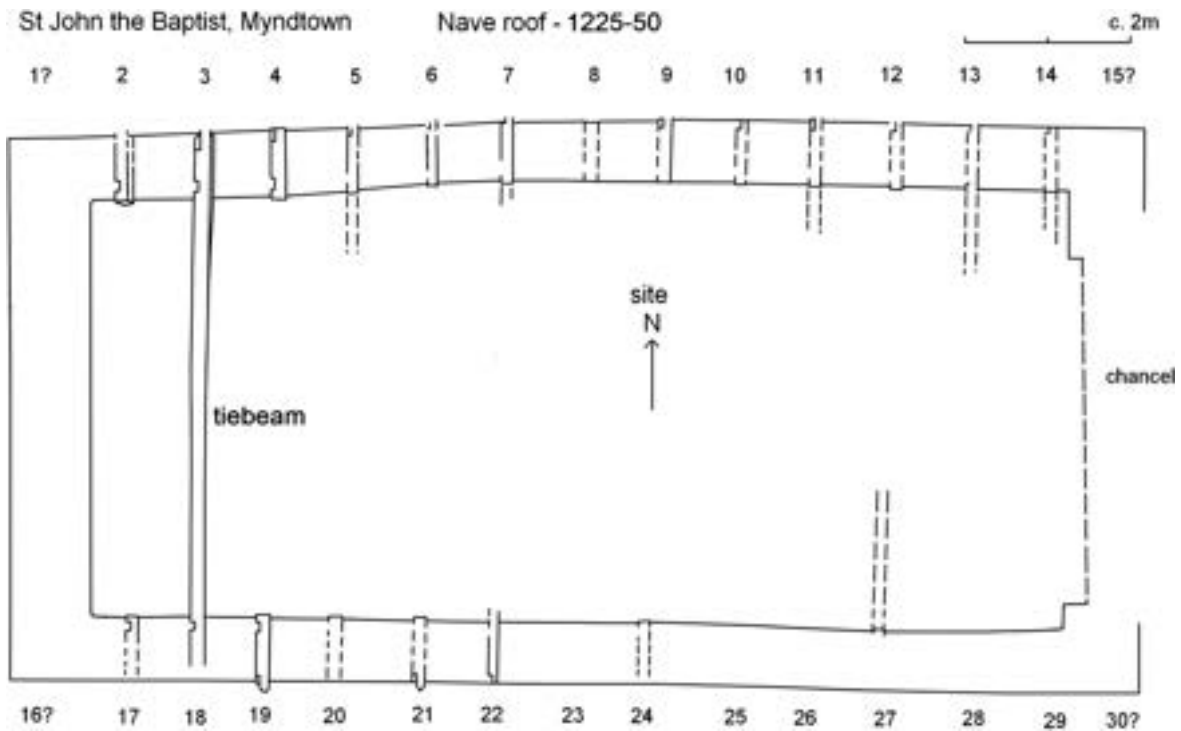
Simplified plan of nave showing the surviving 1225–50 roof timbers at eaves level.
